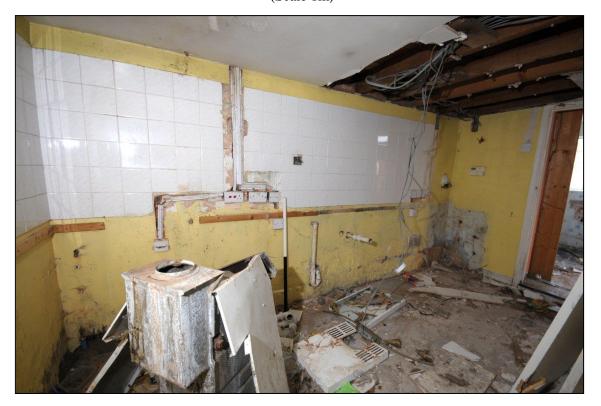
No. 41, kitchen, looking south-west Door to rear extension at right (Scale 1m)
